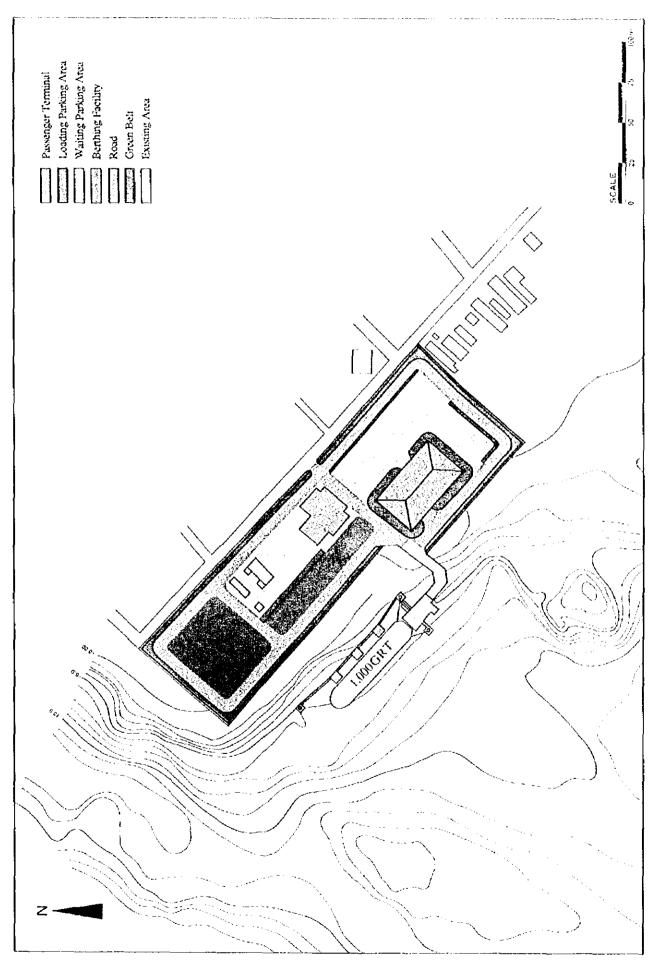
Layout Plan of Labuhan Bajo Ferry Terminal
